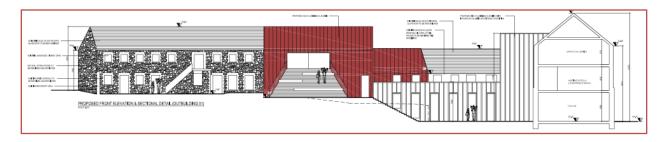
Elevation Plan detailing (from left to right) the youth space and Fablab which open onto an internal public realm space.
